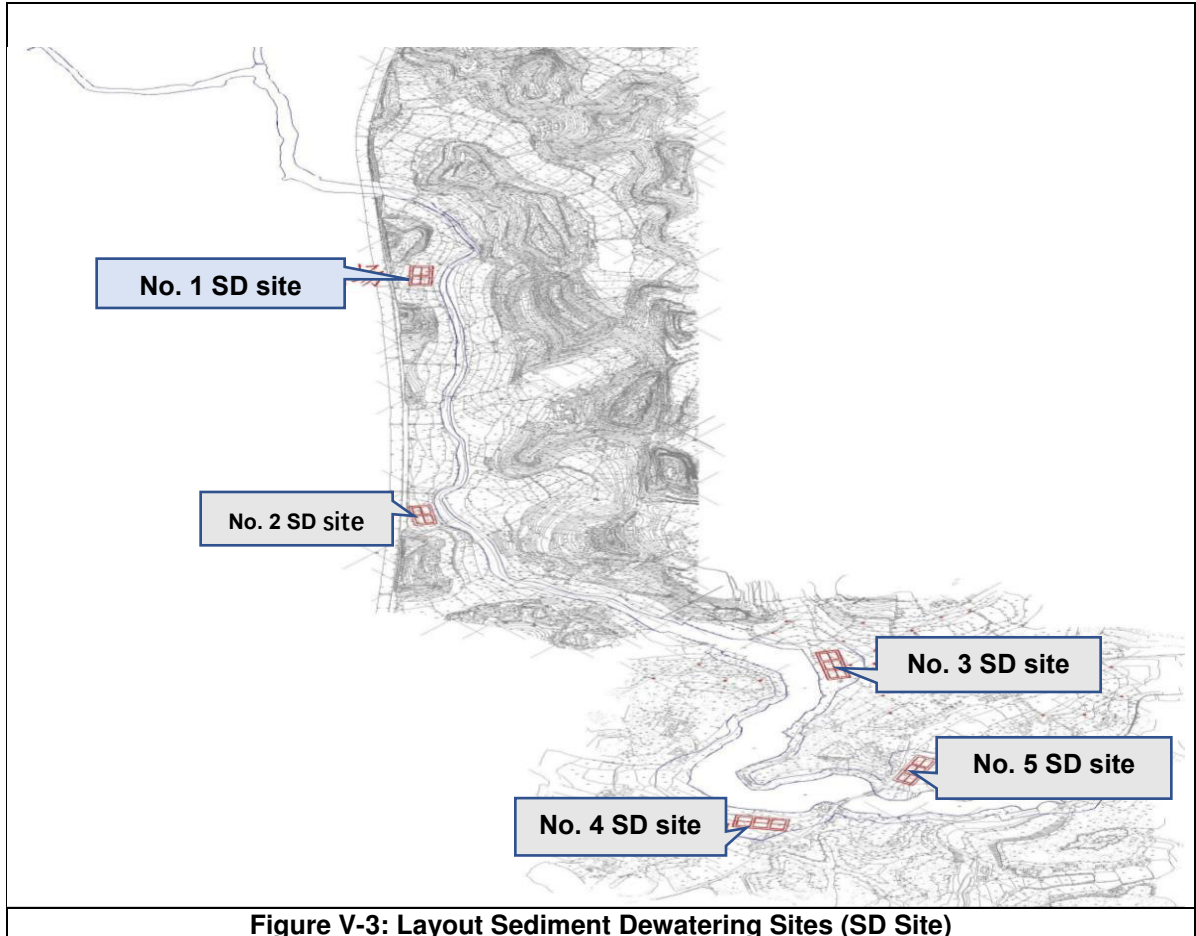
Layout Sediment Dewatering Sites (SD Site)
